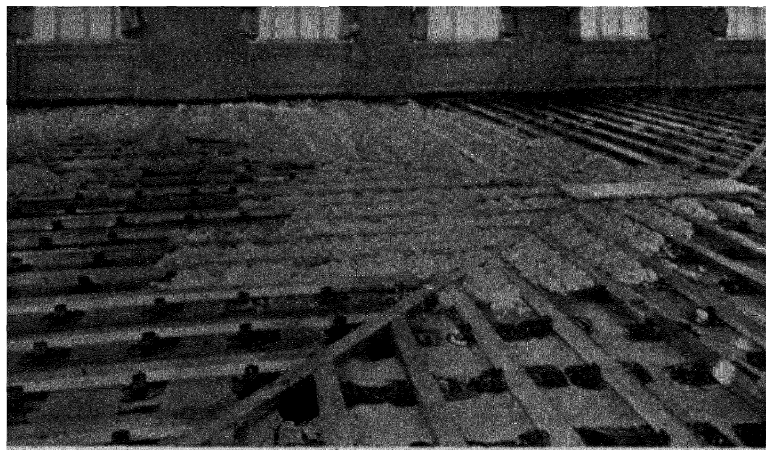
The photograph shows the method of sound-proofing the floor of a dance hall. (*Courtesy Johns-Manville.*)
